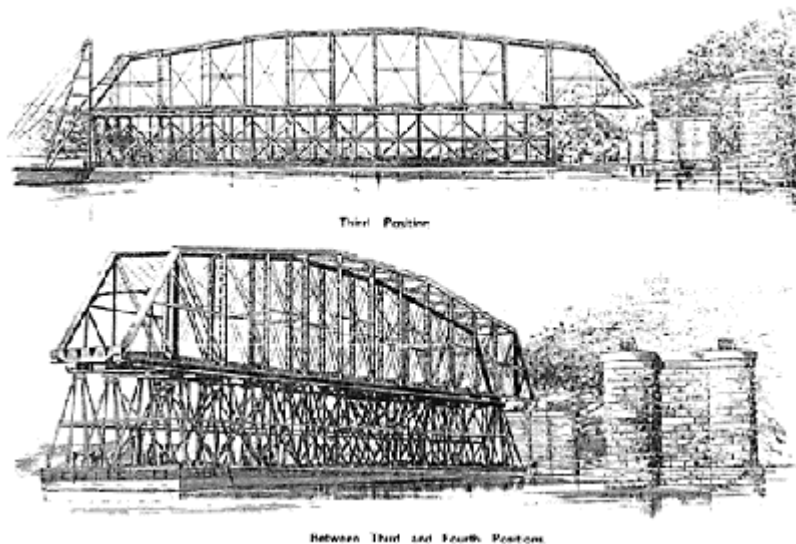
Erection of Span No. 4 in third position showing the overhang and between third and fourth positions (Railroad Gazette, 1888).
